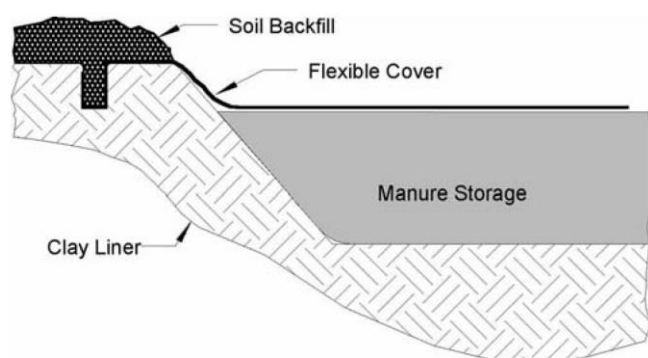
Anchoring a flexible cover (Nicolai et al. 2004)
